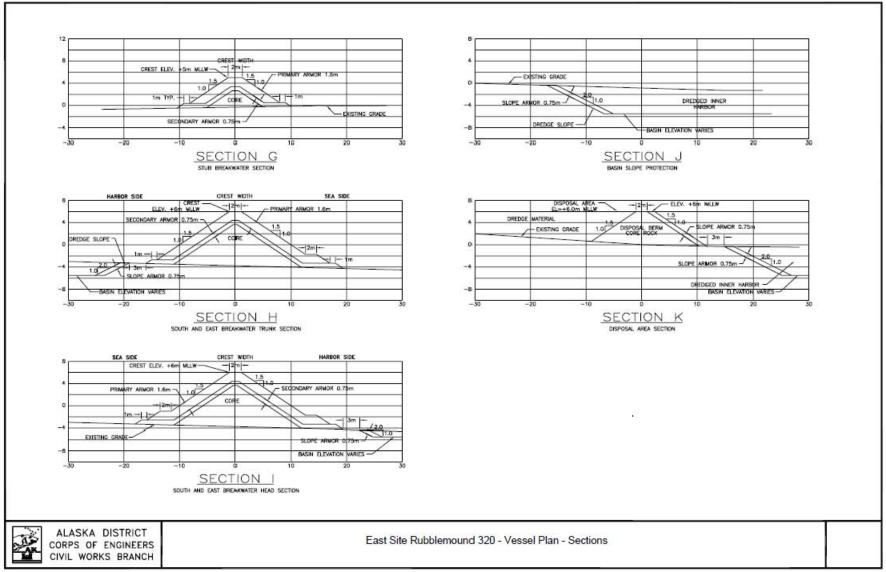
East Site Rubblemound 320-Vessel Sections
